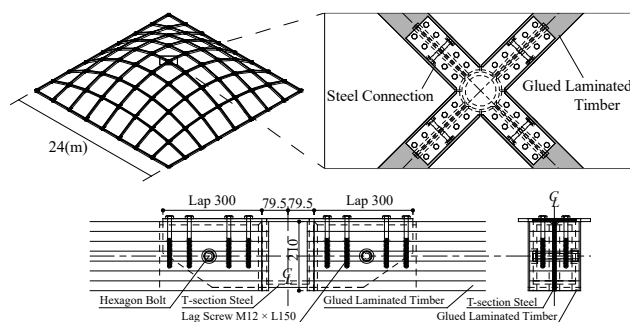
Proposed connection system for the timber-steel grid shell Roof
